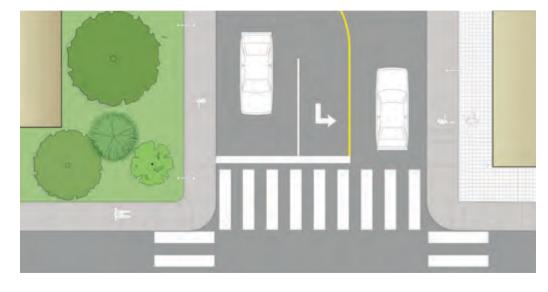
Plan of the Existing Conditions of Broadway Avenue intersection with Mount Pleasant Road
